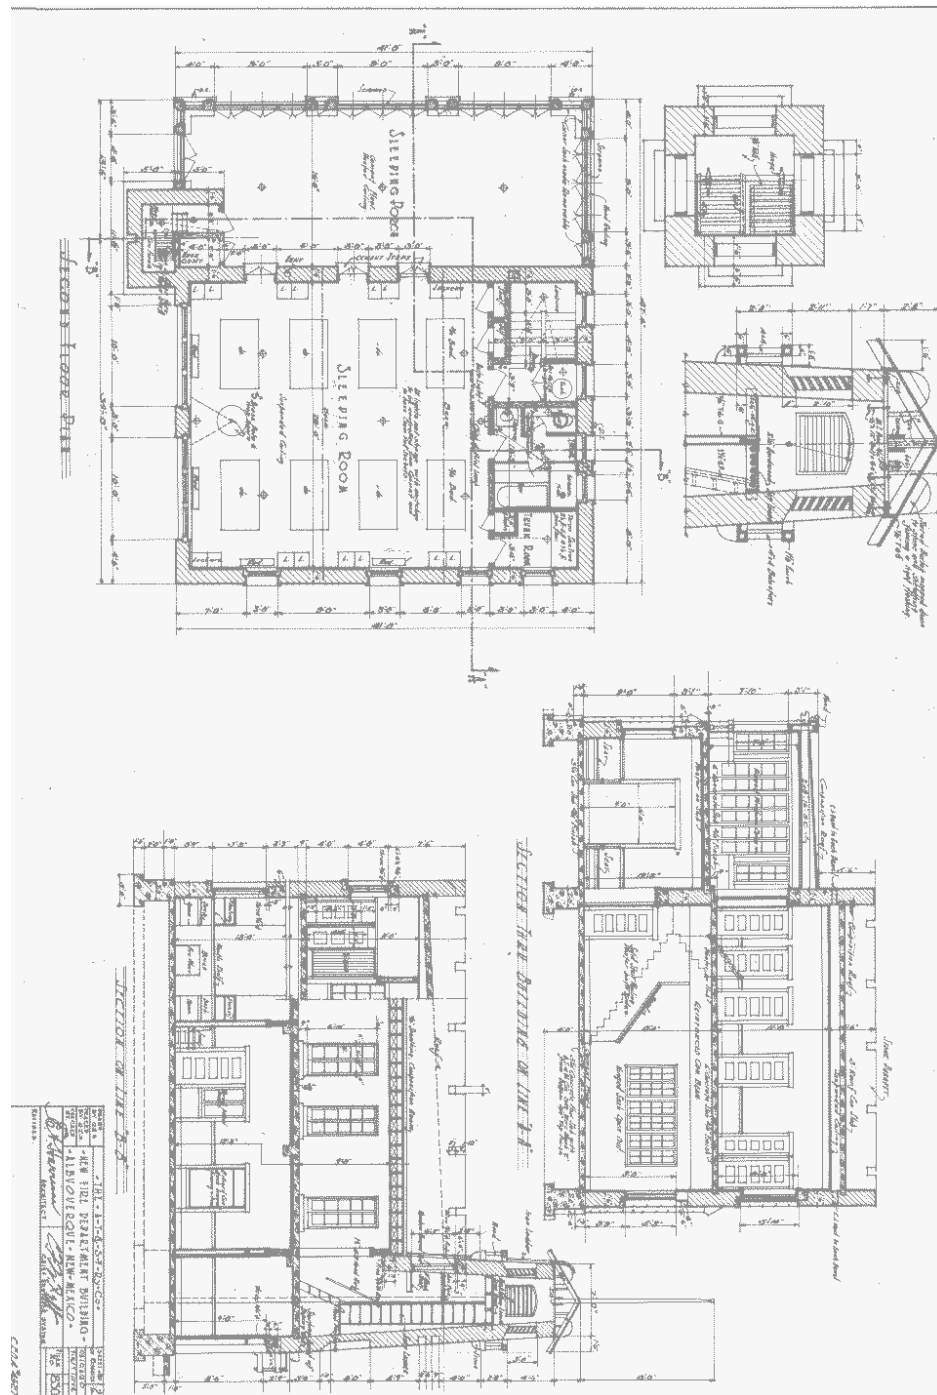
Construction drawing showing plan, sections and tower details. AT&SF Engineers, drawing c.1919
